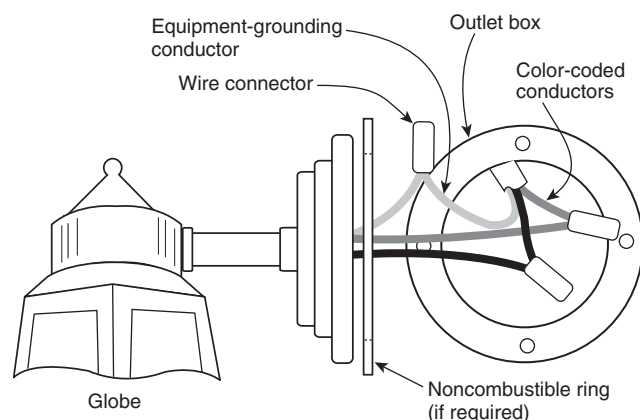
Installation of Surface-Mounted Exterior Lighting Fixture.
